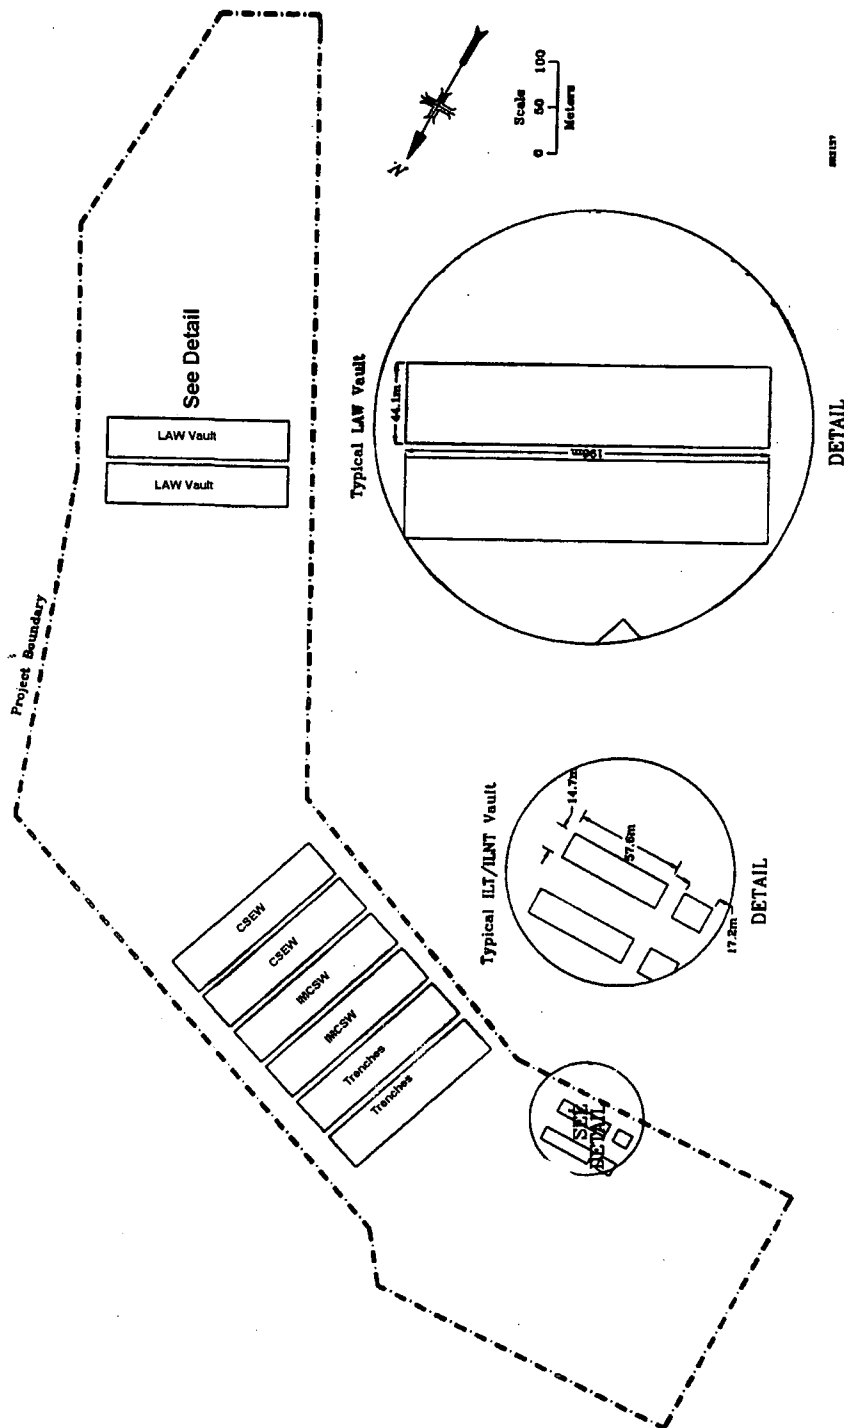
Projected Layout of the E-Area Low-Level Waste Facility
